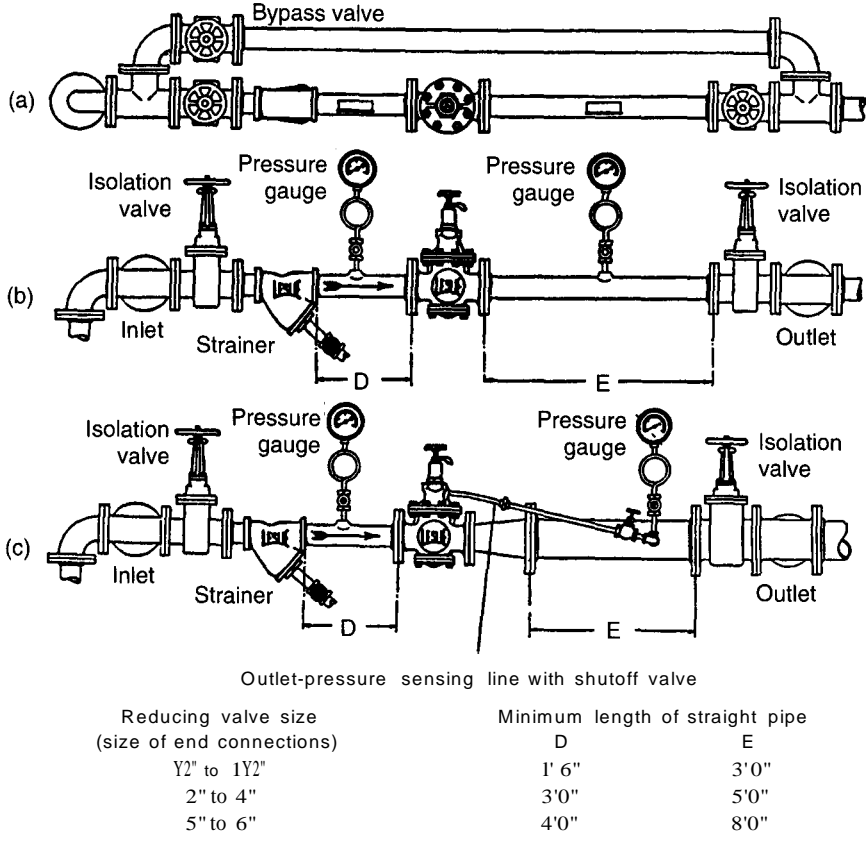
Typical pressure-reducing valve installation arrangements: (a) plan view, (b) elevation, reducing valve with internal sensing port, (c) elevation, reducing valve with external sensing line. Courtesy Leslie Controls, Inc.
